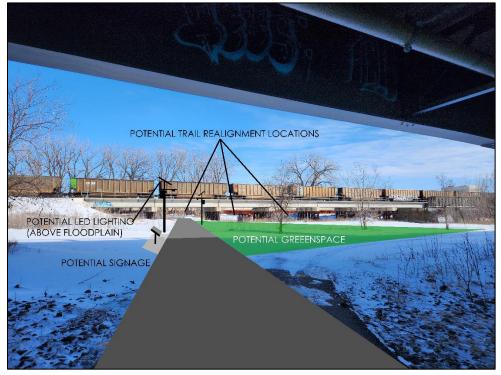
Potential Trail Realignment (looking north under Main Ave bridge)
